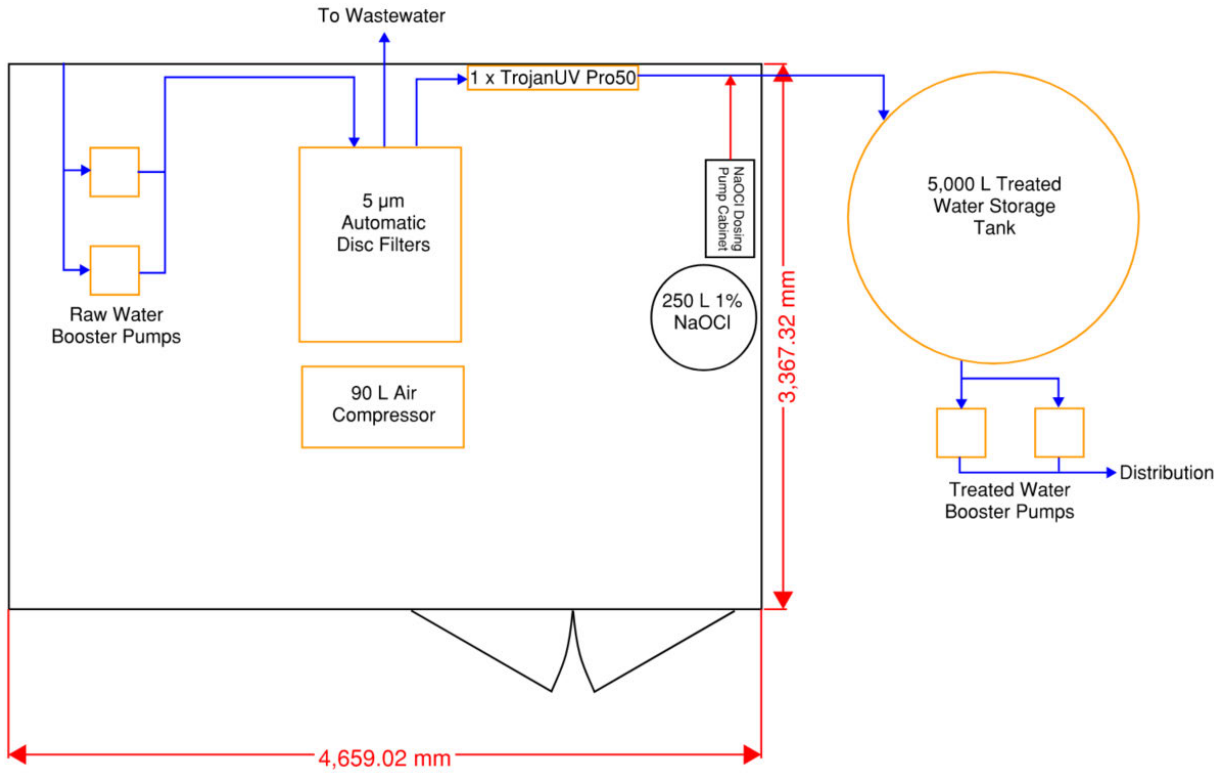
Preliminary Doolans Creek Right Branch WTP general arrangement sketch
